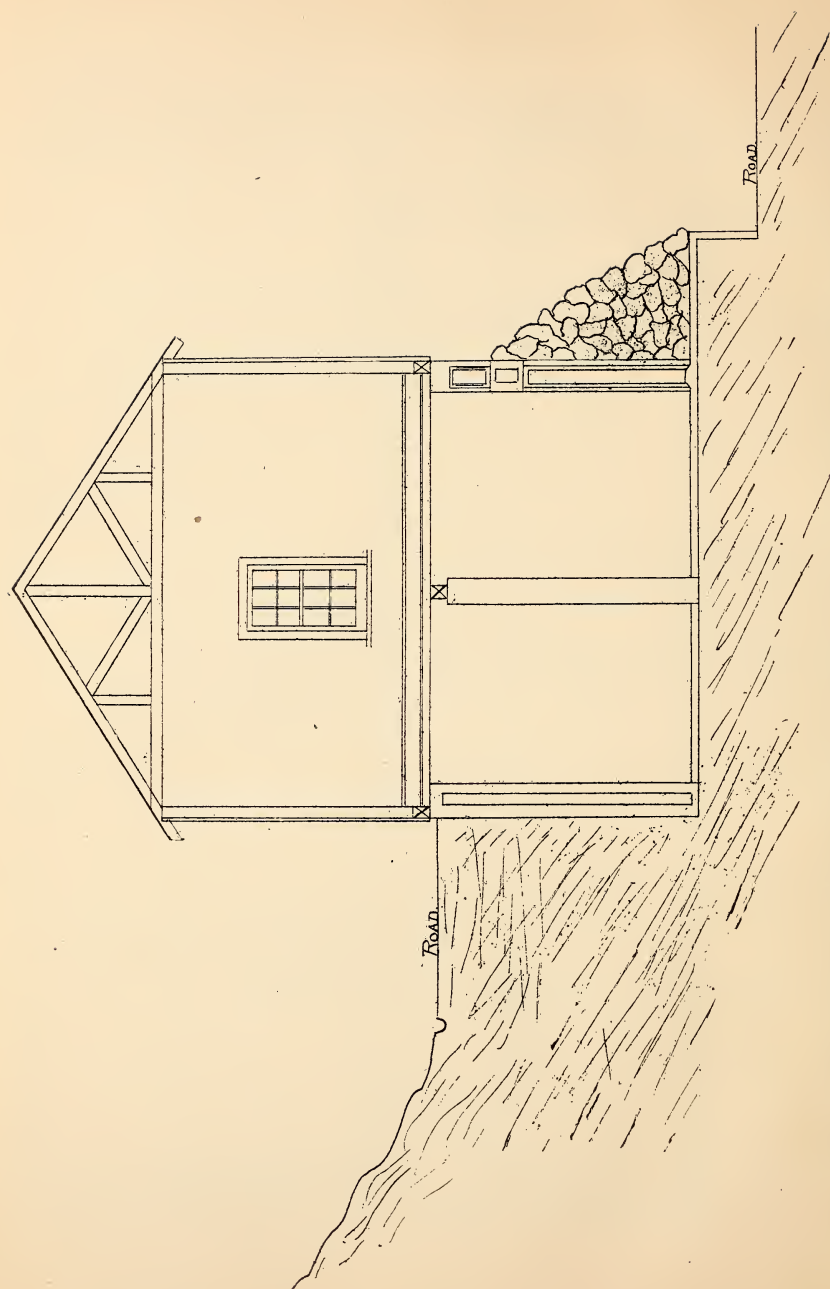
Cross-section of Gold Medal Orchards' apple storage house, showing earth insulation and position of roads.
